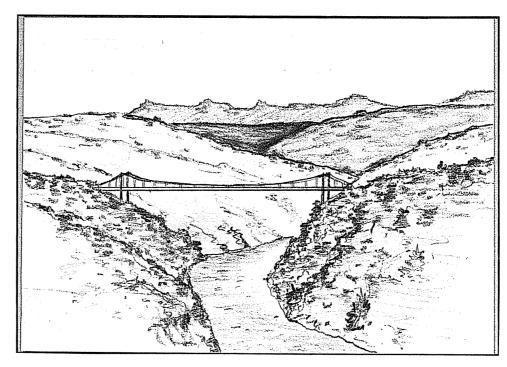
B.3 EXISTING CONDITIONS NEAR PROPOSED ROAD CROSSING TSUSENA CREEK
